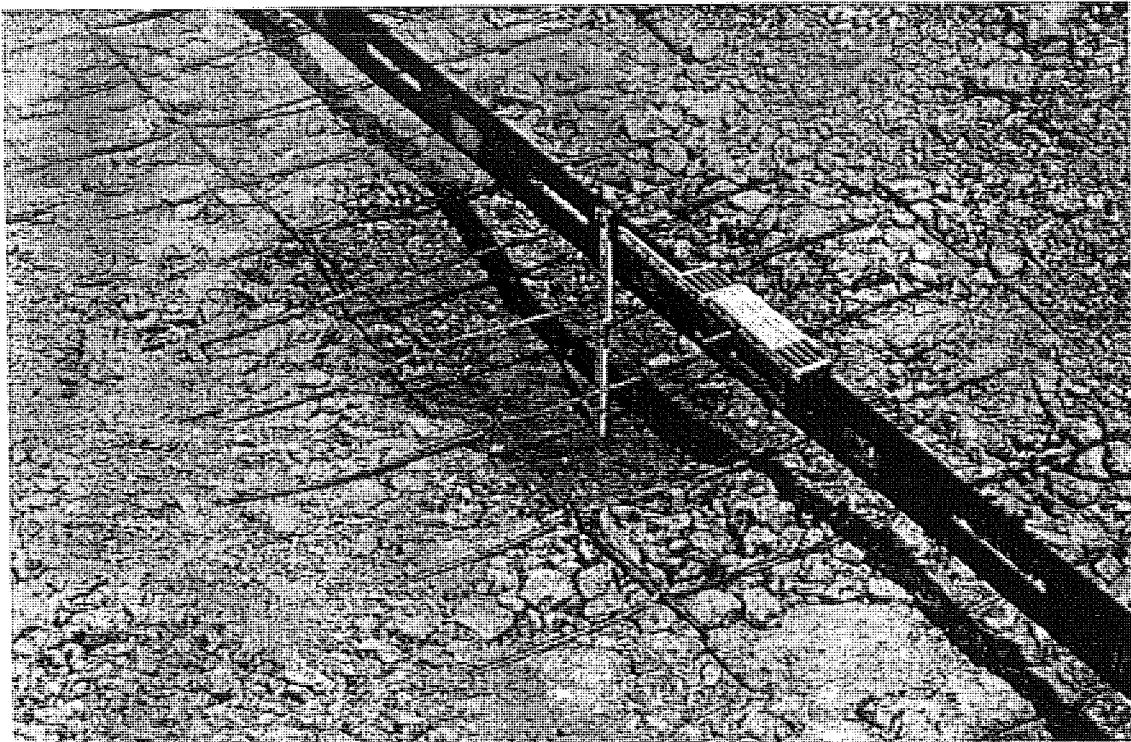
Old US-10 (North Bradley) trench in rubble concrete (station 25+594)
